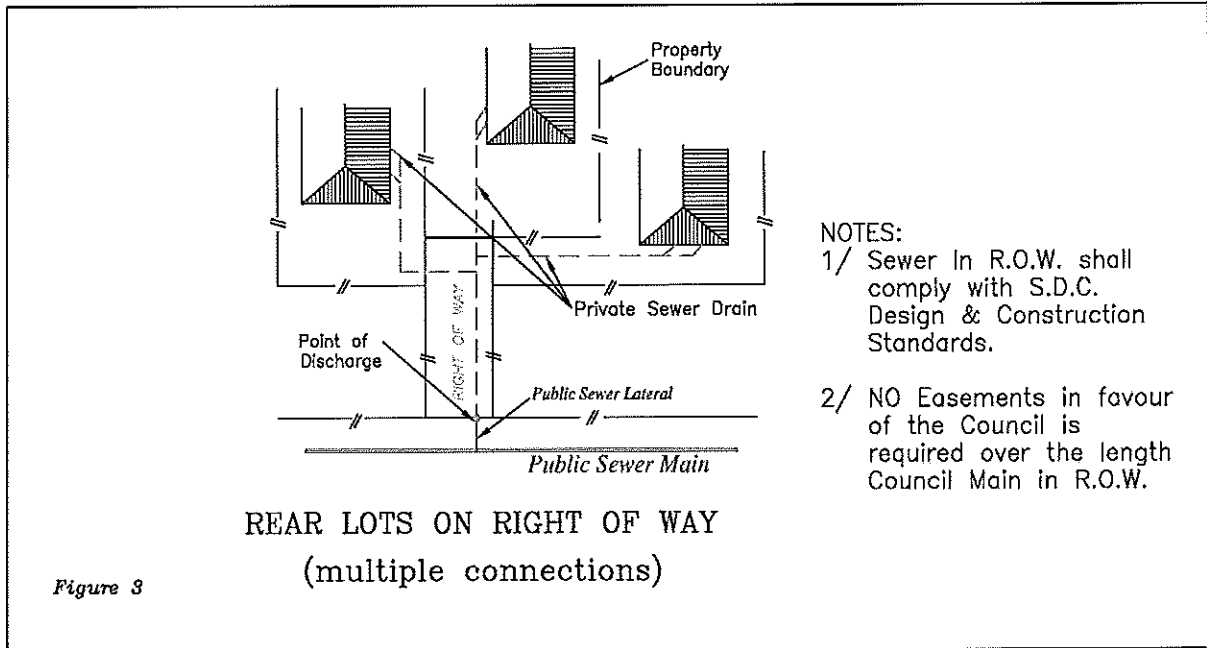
Typical layout at point of discharge – Individual customers multiple connections rear lots on Right of Way – No easement required.
